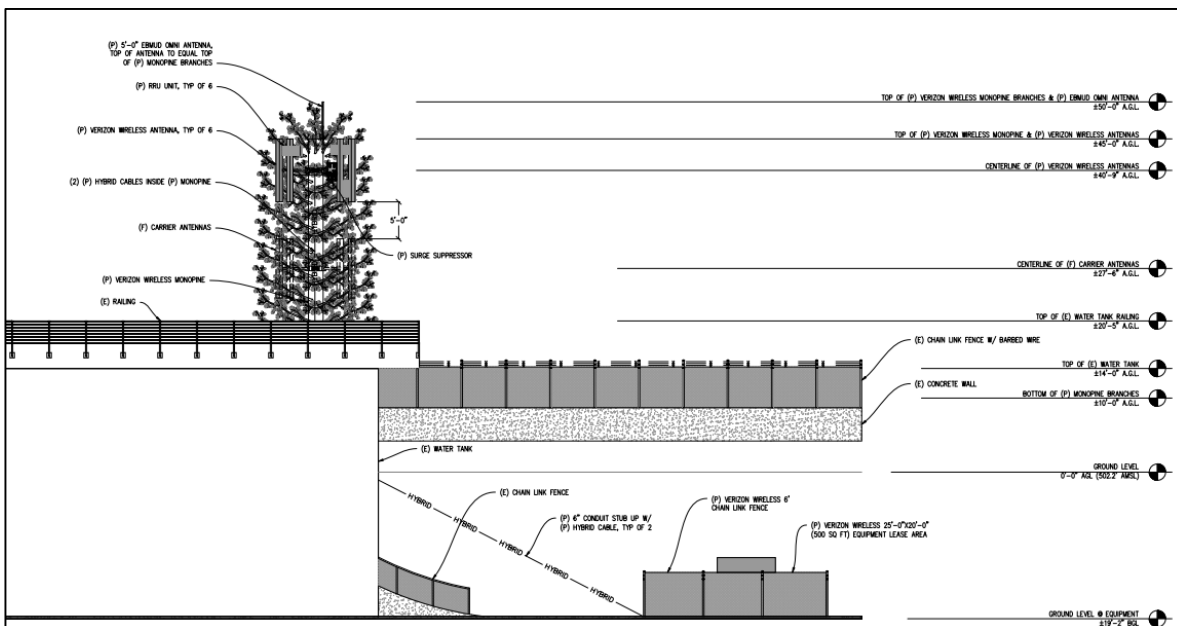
South elevations of panel antennas (Source: Plans, Page A-6).
